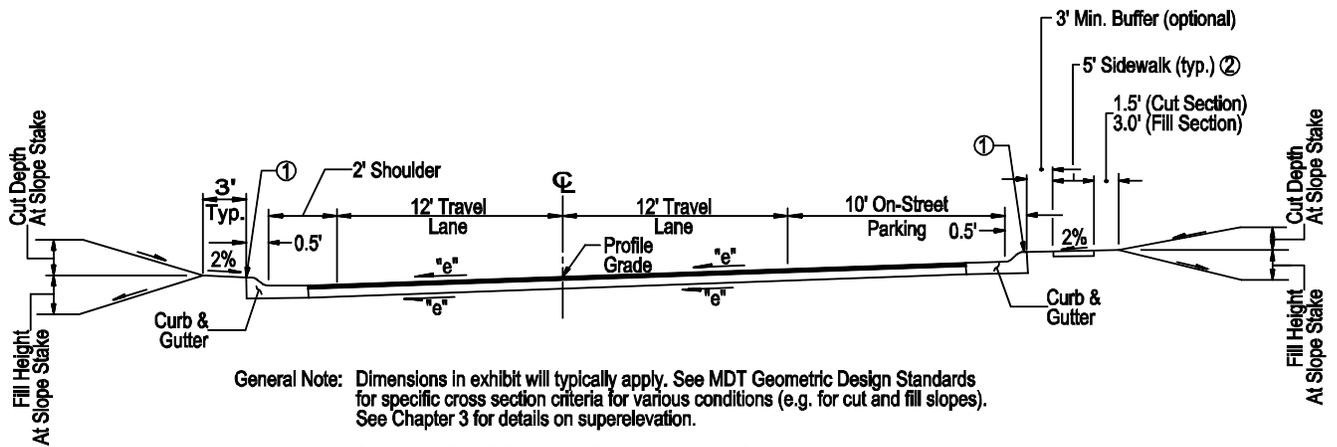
Typical Curbed Roadway (Tangent Section)
